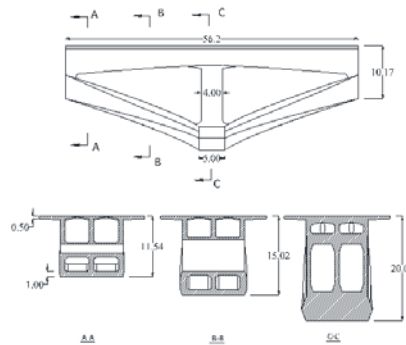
Dimensions of Main V-Shaped Structure Schematic Diagram (Unit: m).
